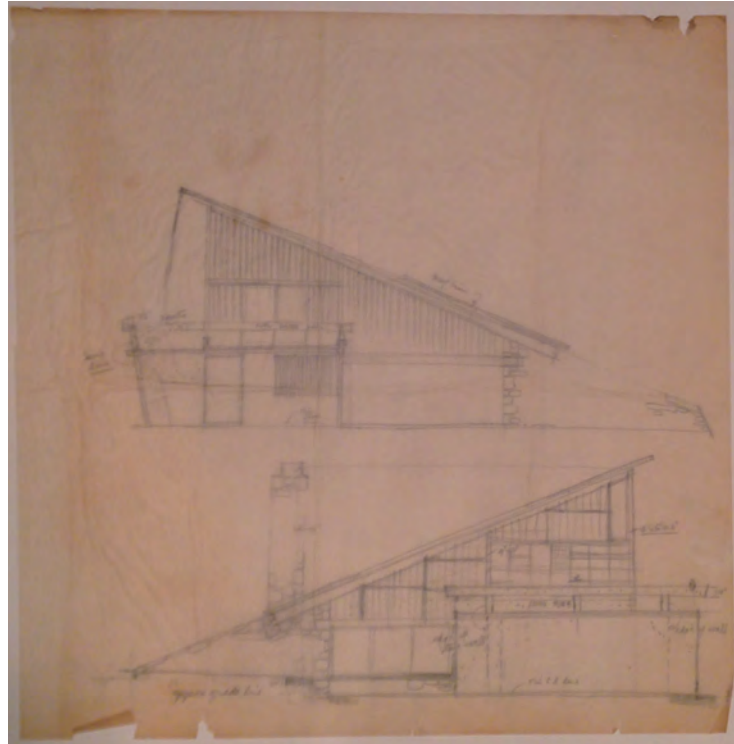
George Nakashima's hand drawing. South and west elevations. Source: George Nakashima Woodworker SA, Ltd. Archives.
